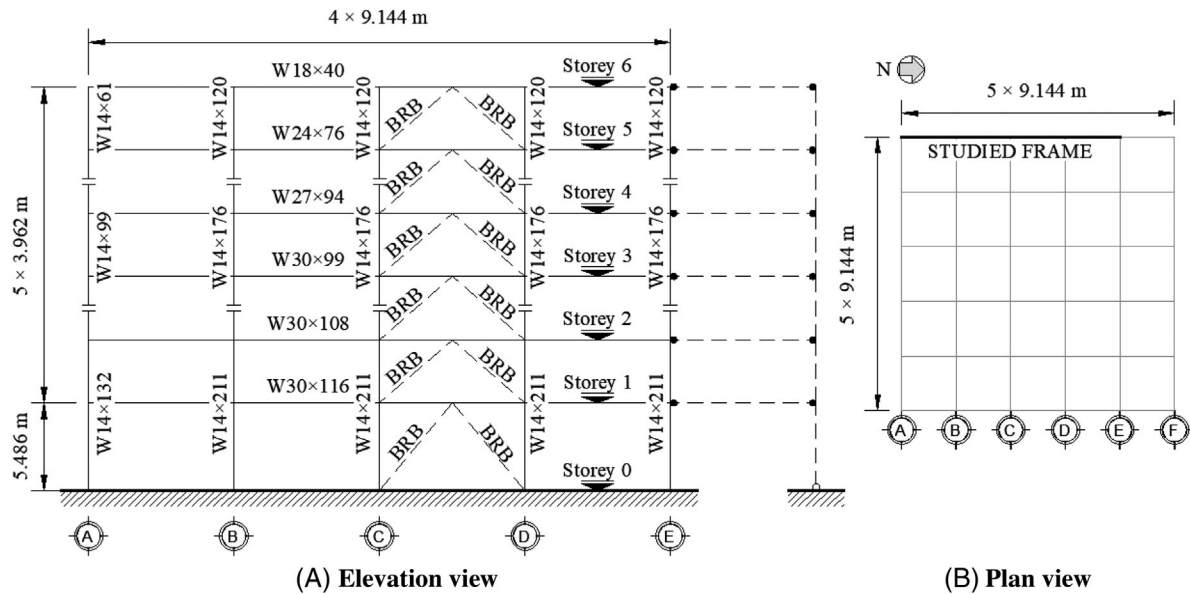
Case study structure B (representative of an existing mid-rise steel MRF) (A) elevation view, (B) plan view
